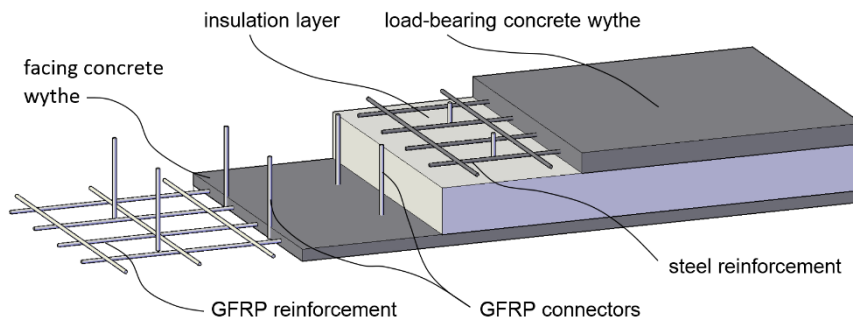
Precast concrete sandwich panels (PCSP) with GFRP-reinforcement and connectors (specimens CS1 and CS2).
